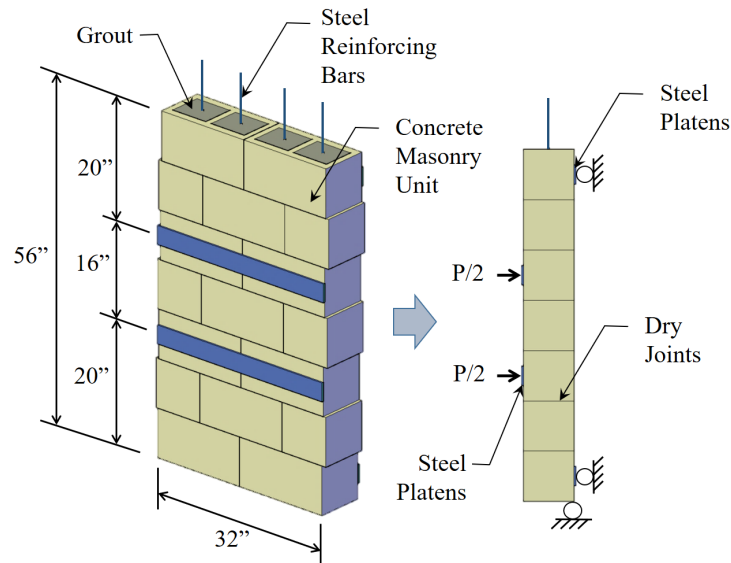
Reinforced dry-stack concrete masonry wall model.
